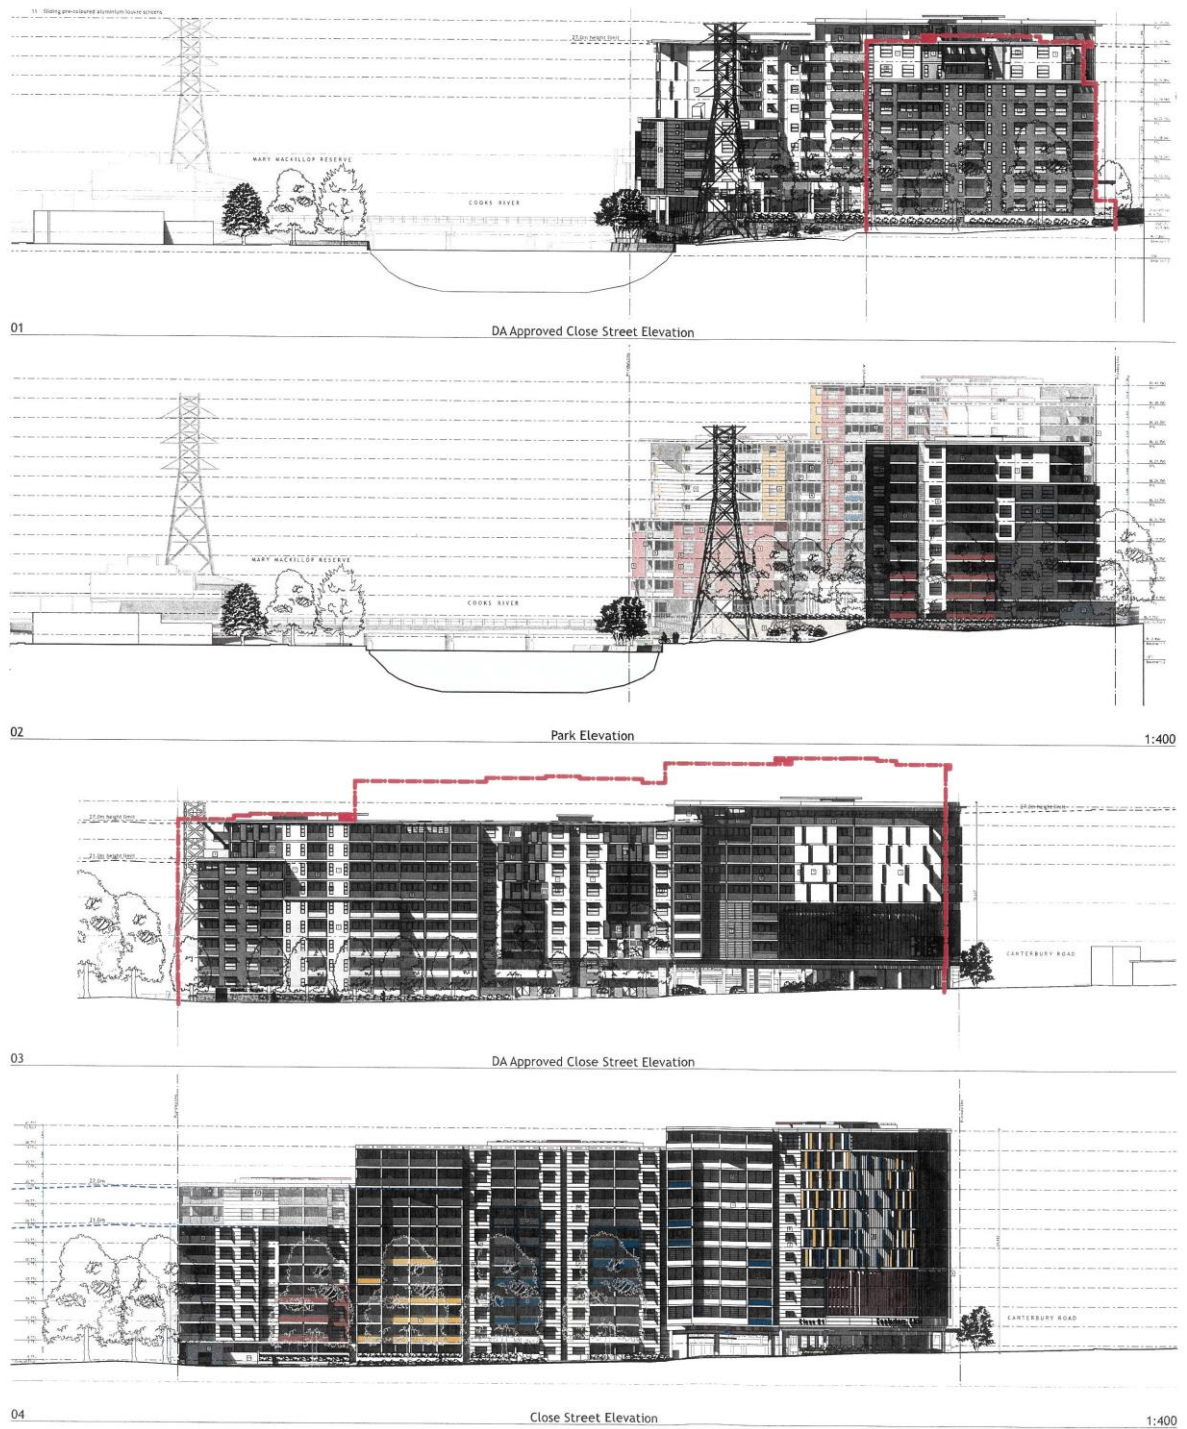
Park Elevation and Close Street Elevation Drawing 11.119.S4.55.201 (DA Check).A (Ex C-A, Tab 3).
